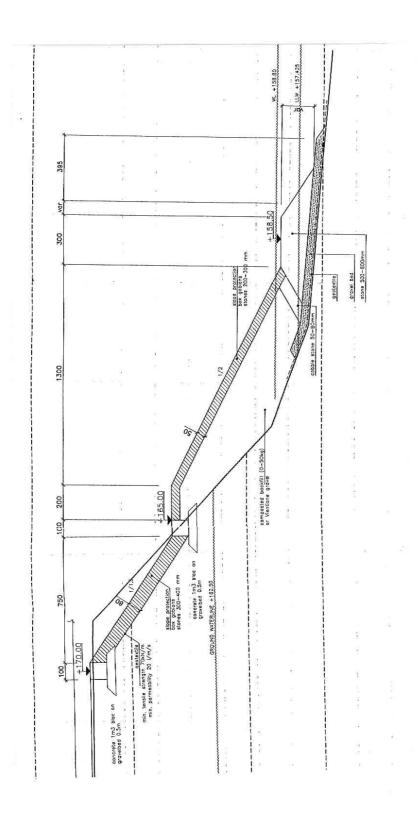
Typical Cross Section of Riverbank Protection Work at Bo O Site
